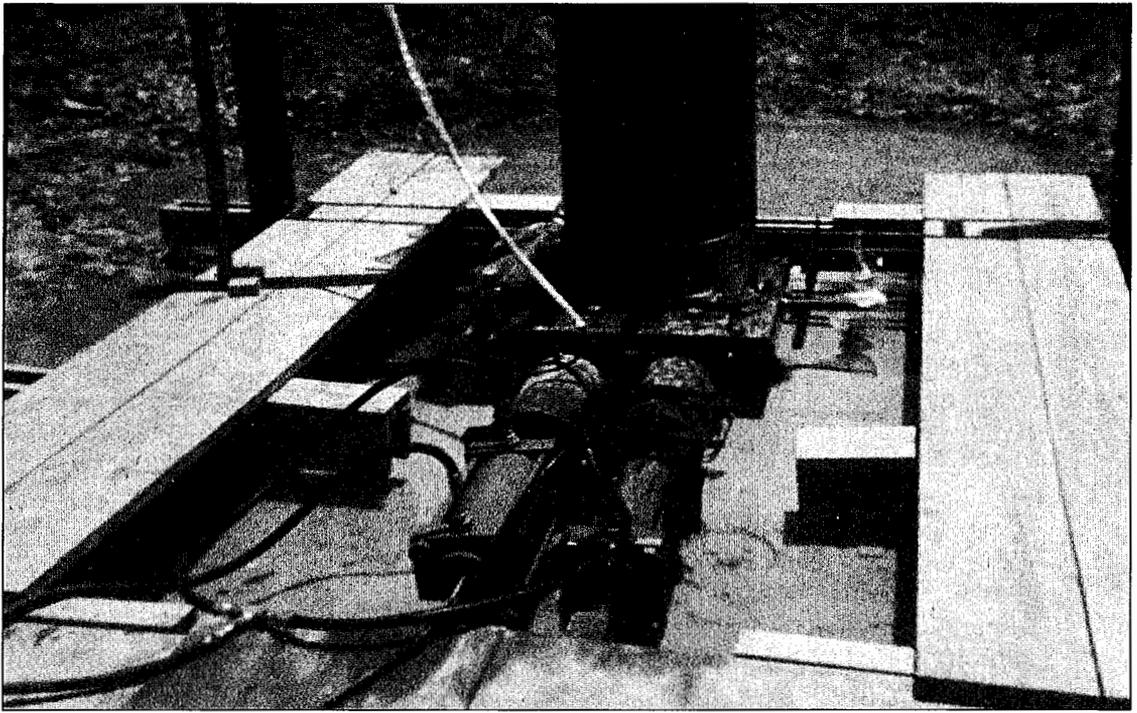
A view of hydraulic rams and load cells in a test of piles in overconsolidated clay.
